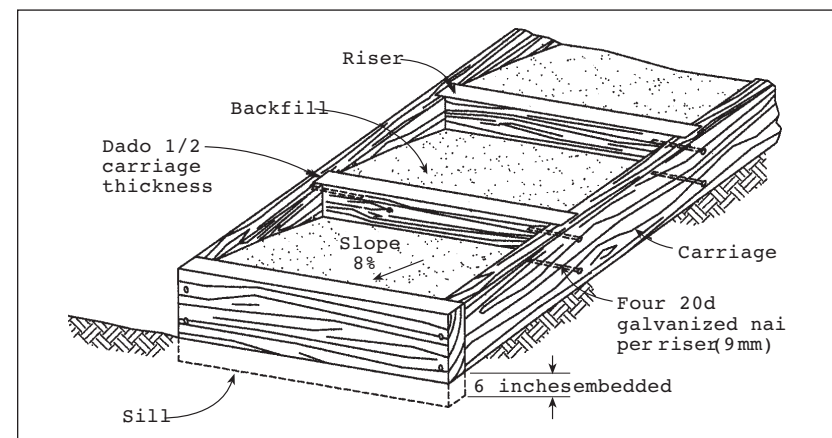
Crib ladder stairway. (Jackson, B. 1993. Recreation Site Design)
